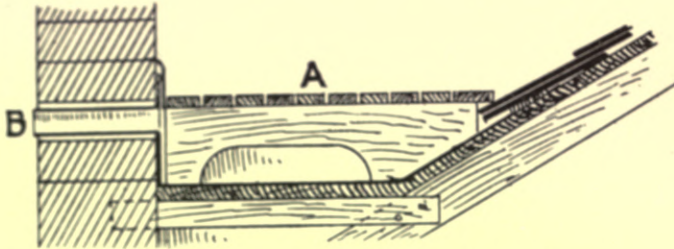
Transverse Section of Parapet-gutter with Snow-boards.
